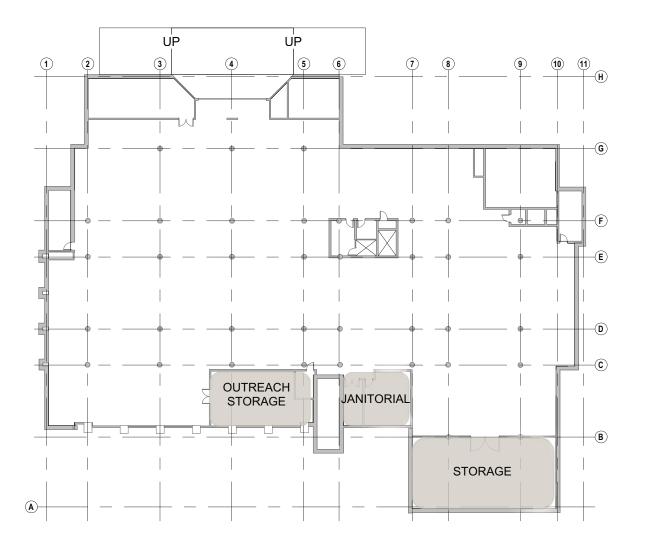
Exhibit B: Architectural Space Plans: Proposed (Overall Floor Plans)
